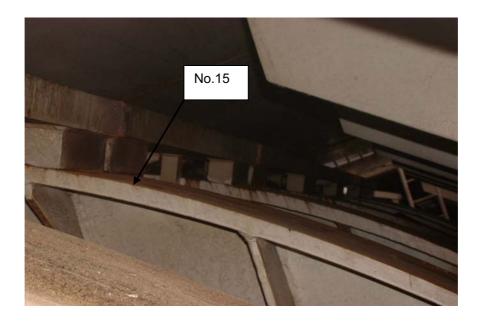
View of a Tongue Plate Holding Down Pin and Spring.
